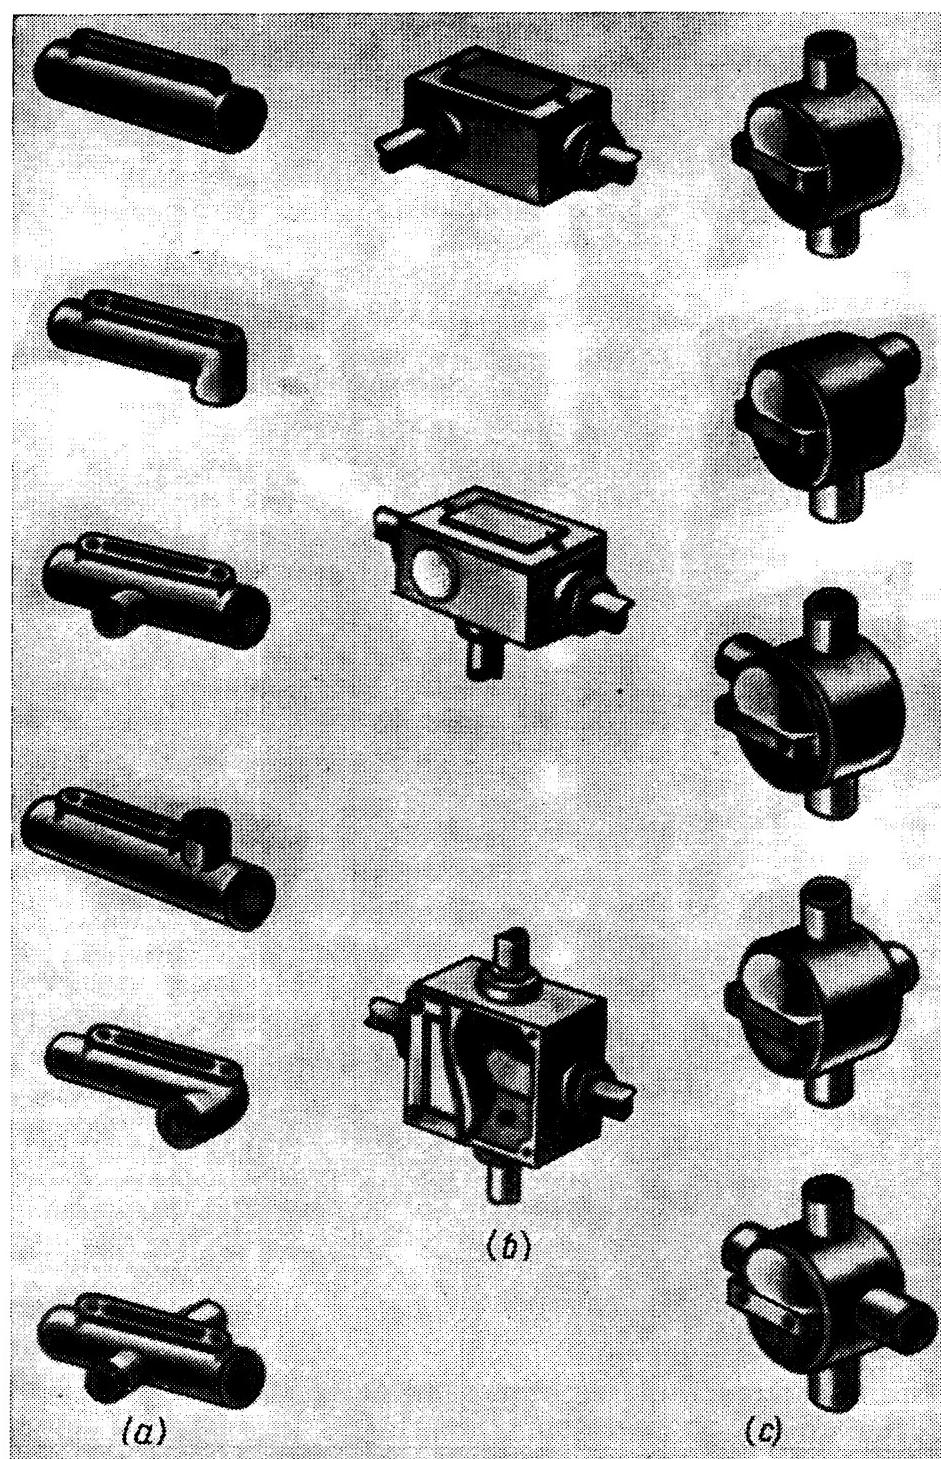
Boxes and fittings (draw-in, angle, tee, and cross-connecting) for drawing-in, connecting, and splicing the wires laid in steel pipes
